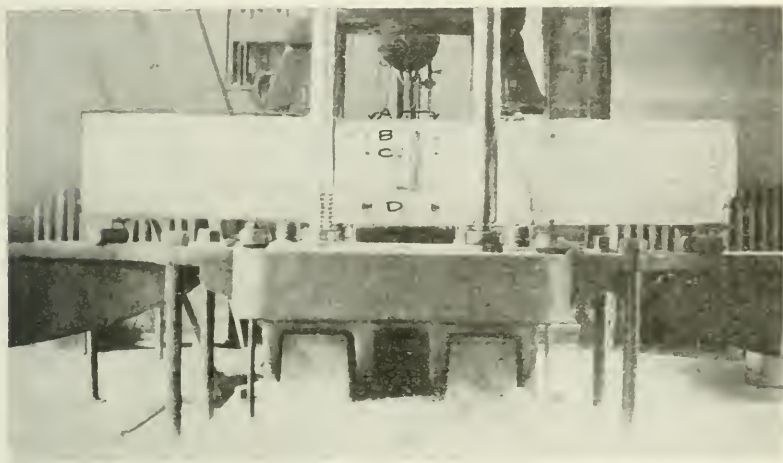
View of 6-ft. Rectangular Beam in Testing Machine
